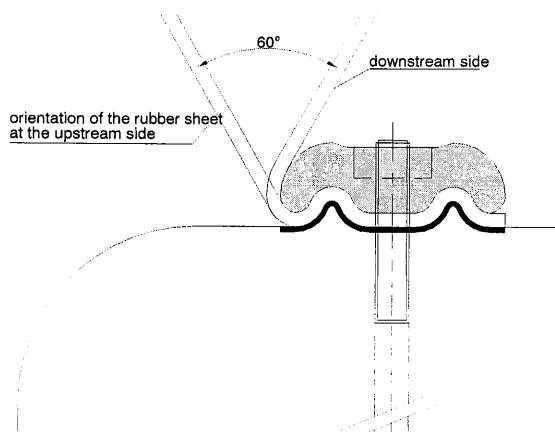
Applied clamp system to connect the rubber sheet to the foundations
